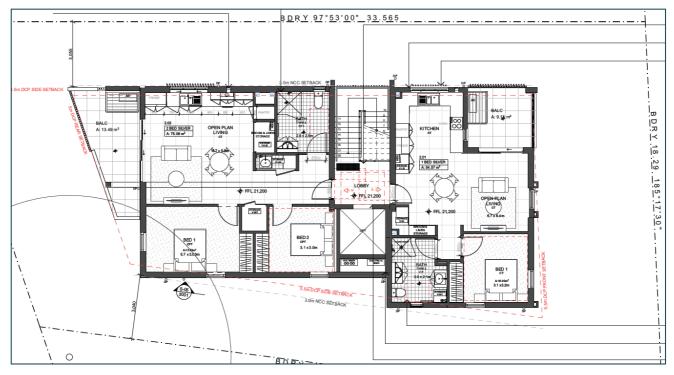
Extract from Architectural Plans – Second Floor Plan (Source: Integrated Design Group, dated 13.12.2024)
